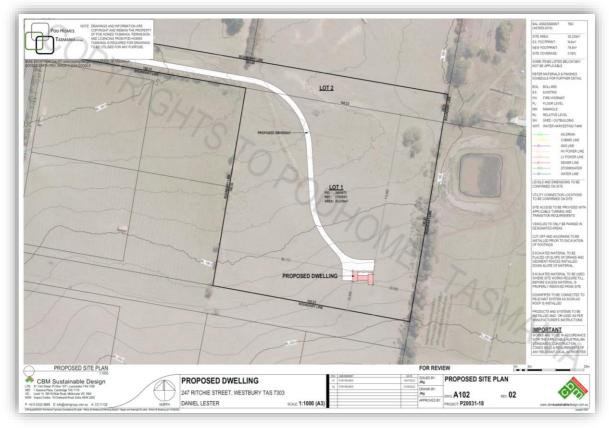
Location and site plans for the proposed dwelling (provided by PHT).
